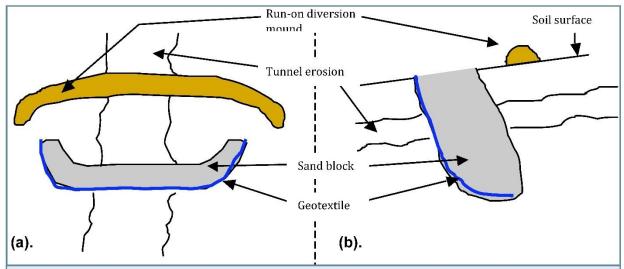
Modified sand block design. (a) plan view, (b) cross section view. The depth of the sand block is determined by the depth of dispersive soils or tunnel erosion. The span length of the structure is determined by the width of the tunnelling.
